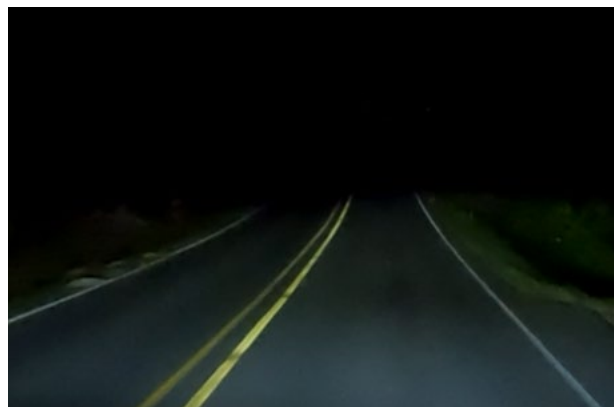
Video showing lighting lack of lighting on westbound Pratt Road west of Ironton Road.
